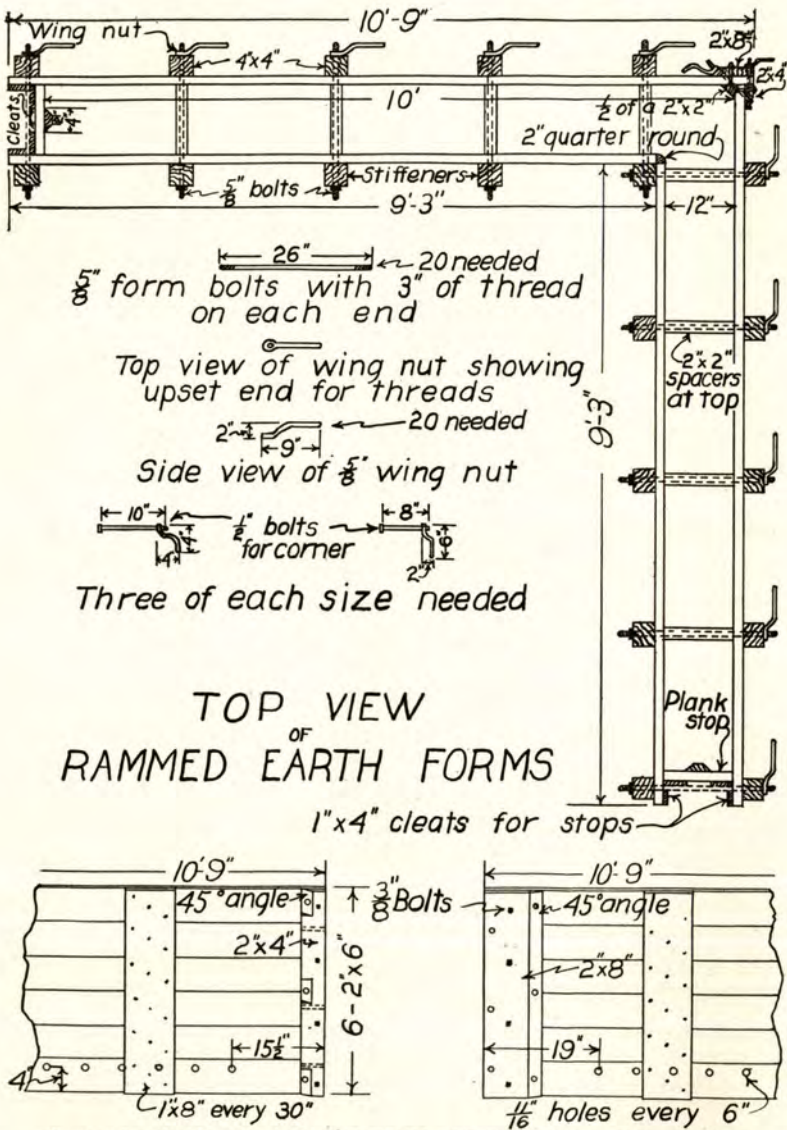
PLAN FOR A LARGE FORM FOR RAMMED EARTH WALLS.
